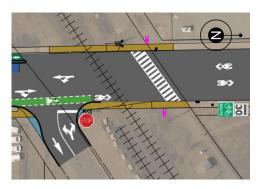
Jamieson Street Intersection and Rail Crossing
